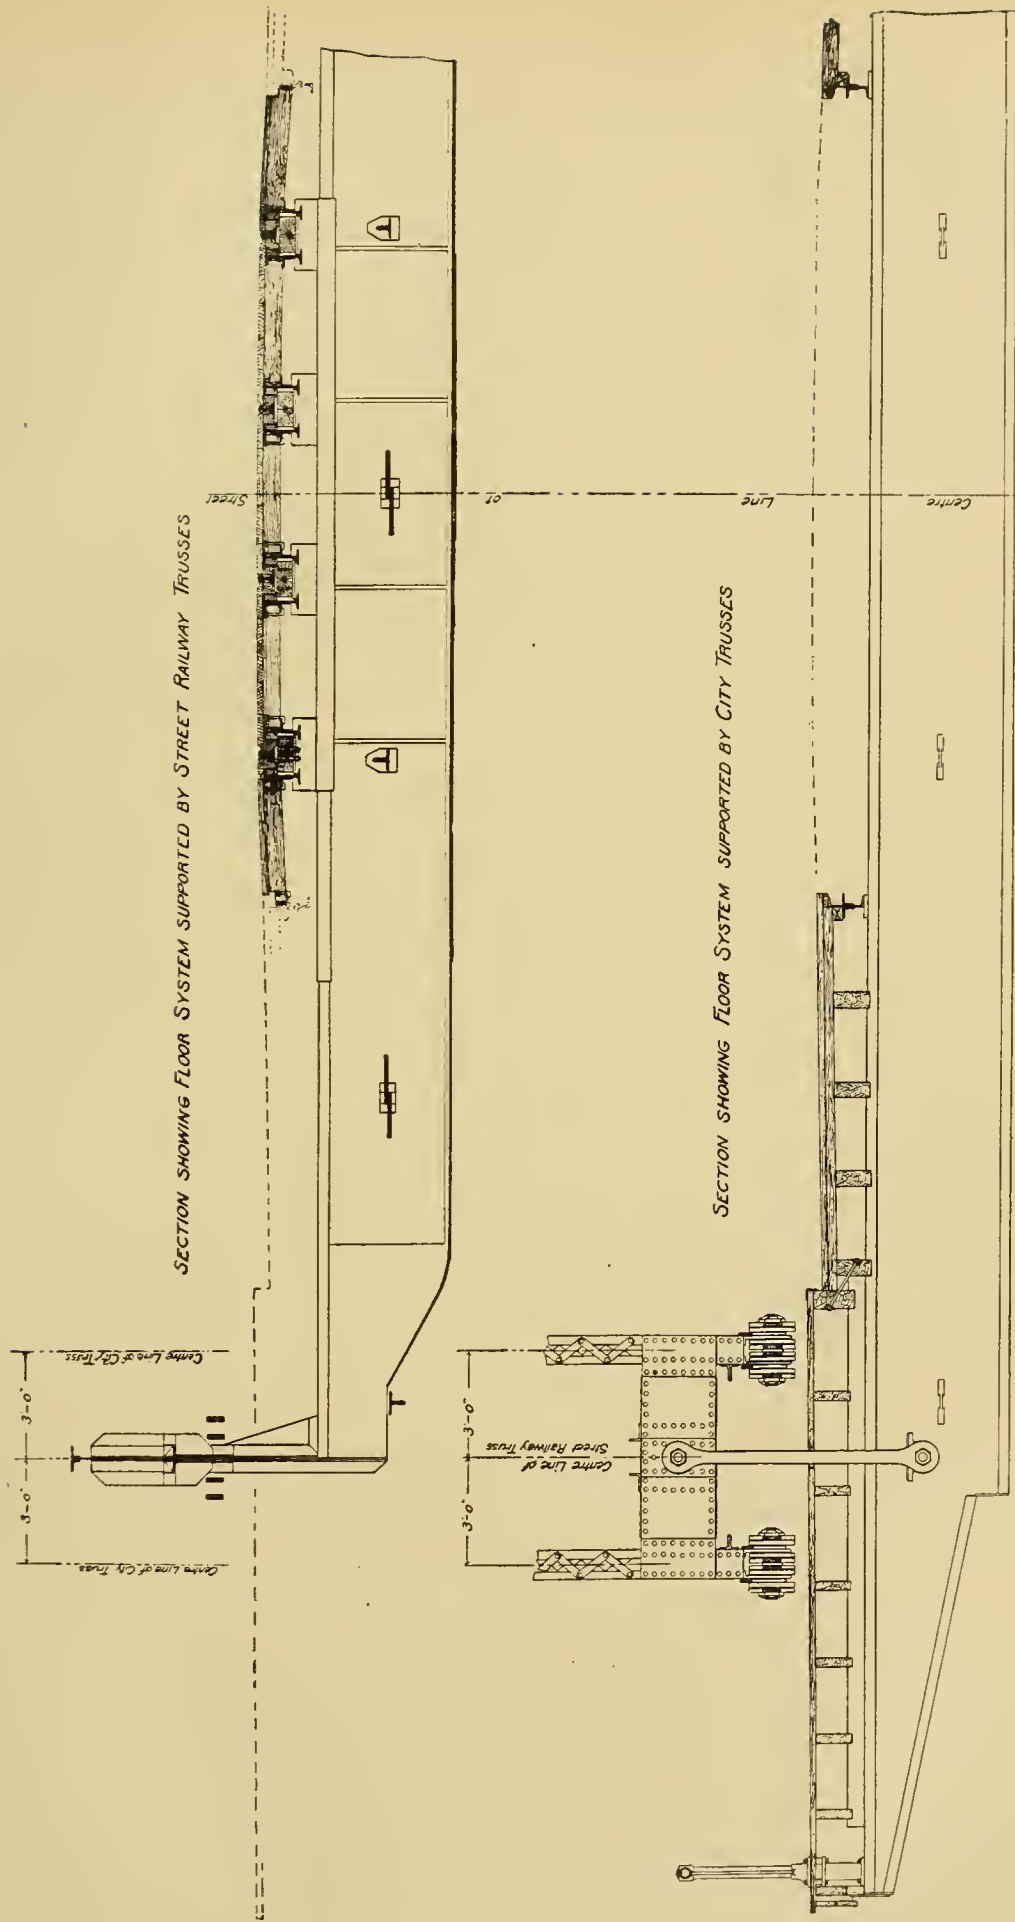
CROSS SECTIONS OF BRIDGE FLOOR AS FINALLY REBUILT,
